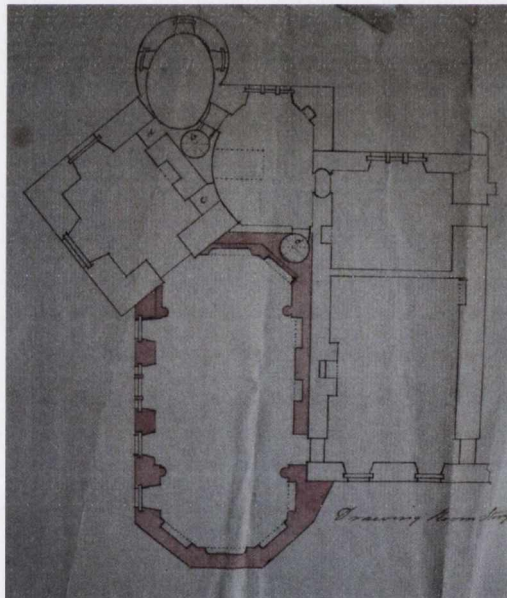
Birr Castle, part of proposed plan of new drawing room, 'drawing room story [sic]', signed 'J. Johnston', [1802–1804], Rosse papers, O/17/26
